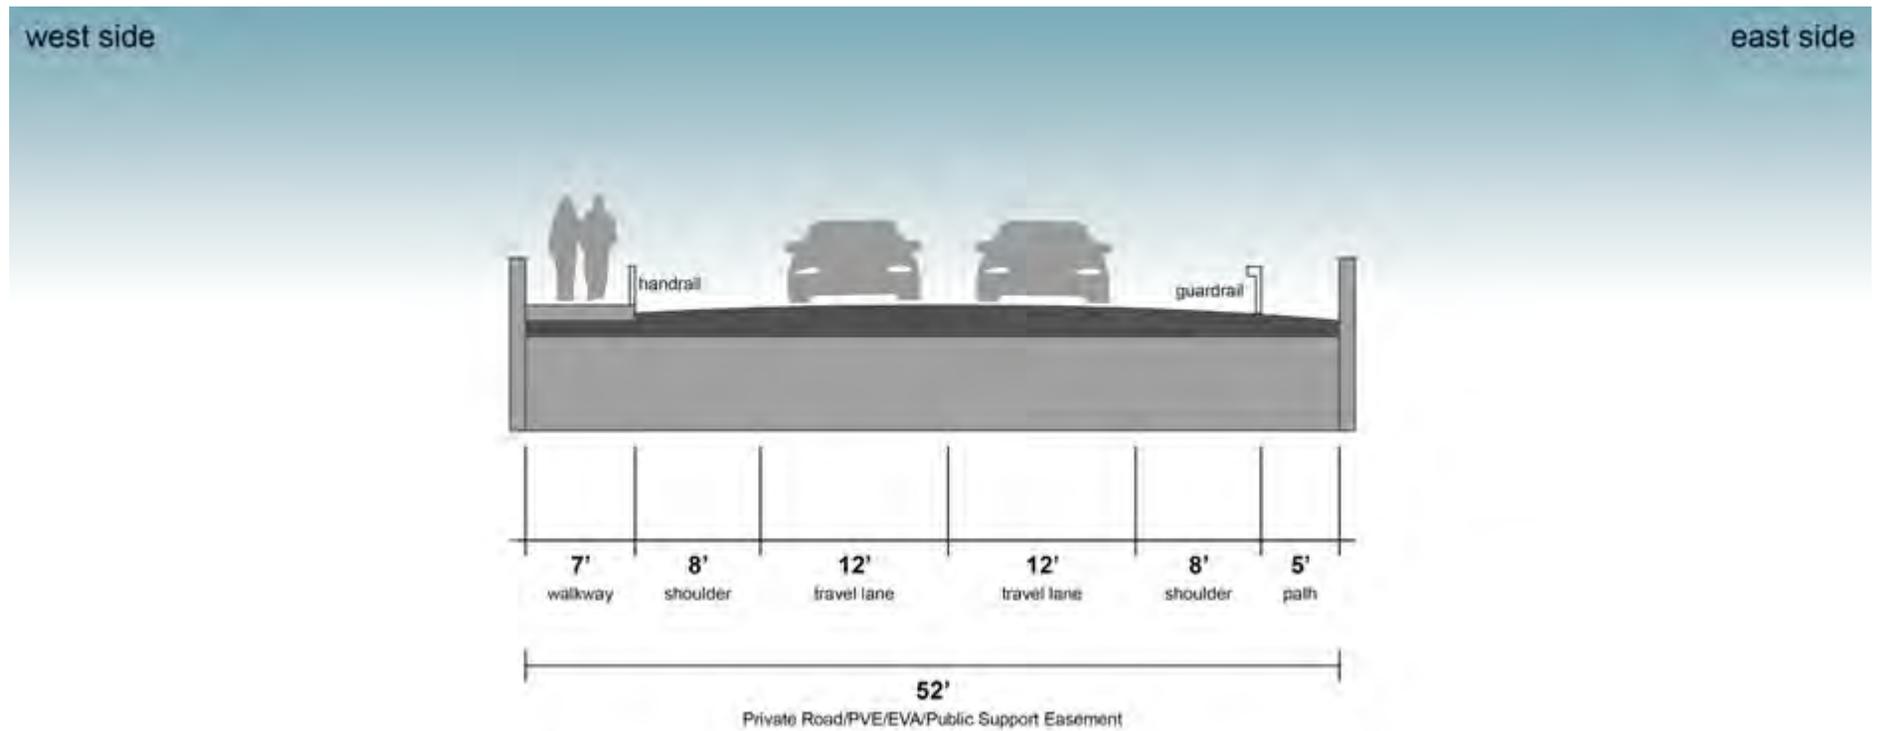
SECTION K: VILLAGE EAST ROAD BRIDGE
